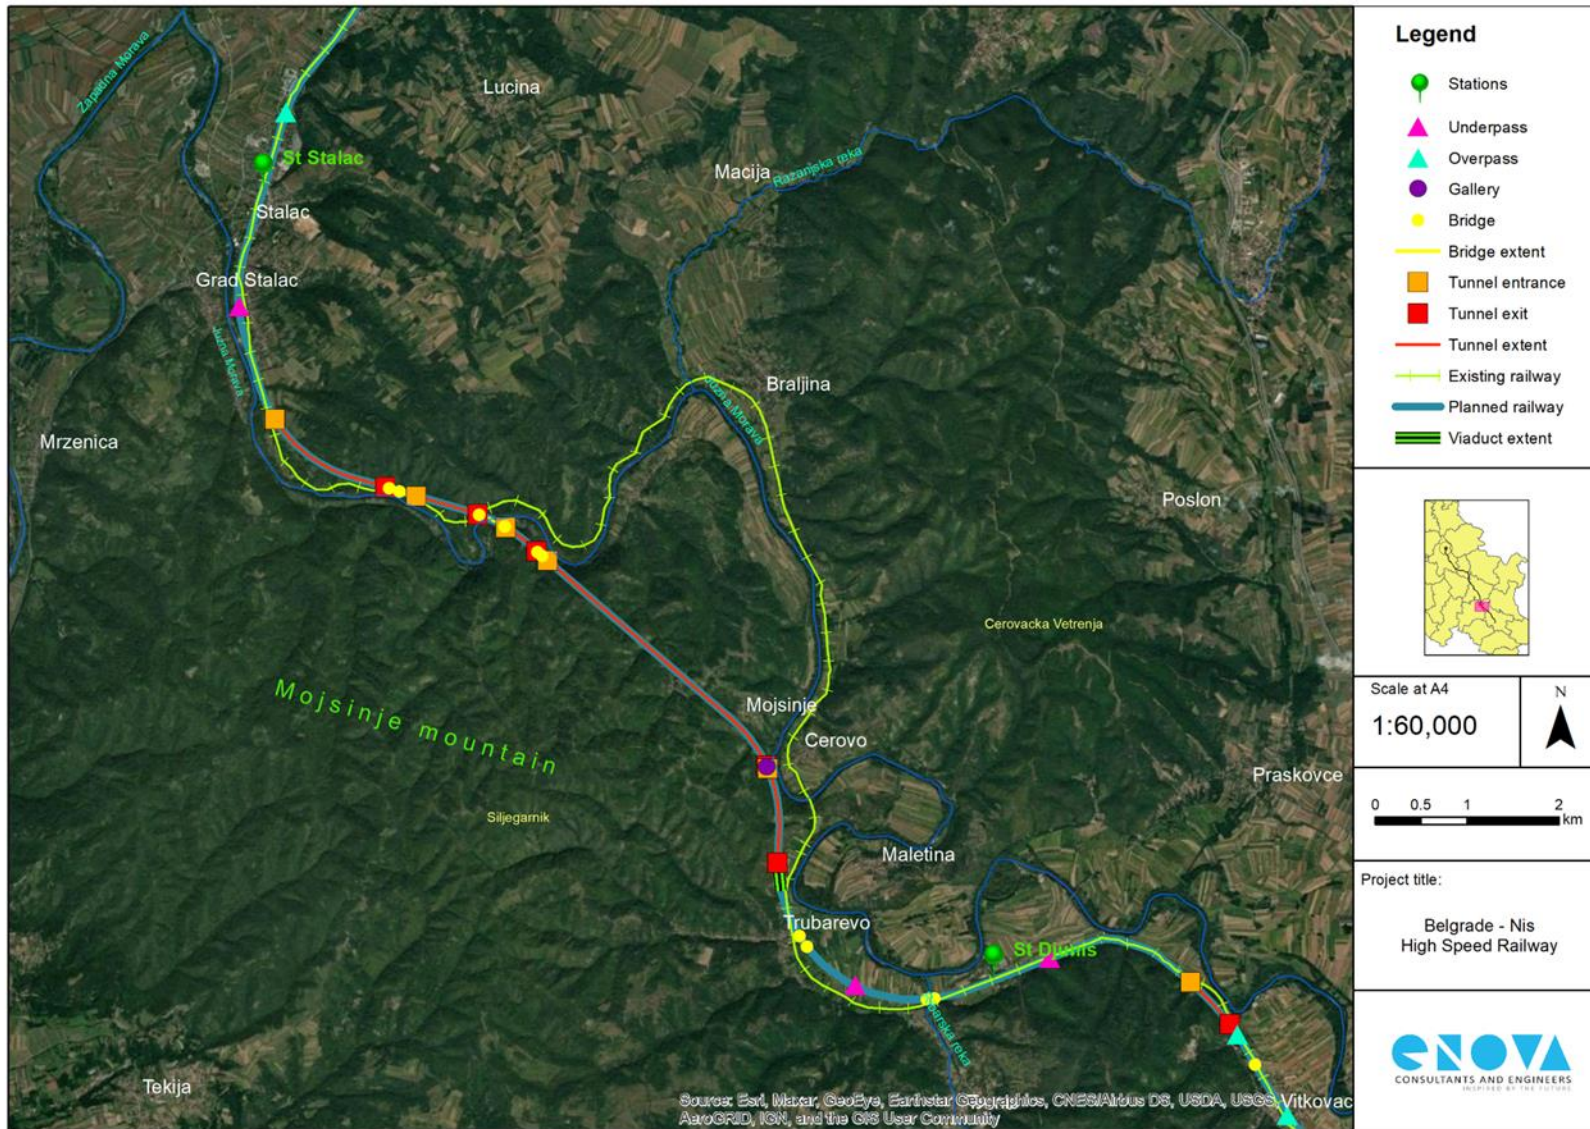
Existing and planned railway with ancillary structures (Stalac-Djunis subsection)
